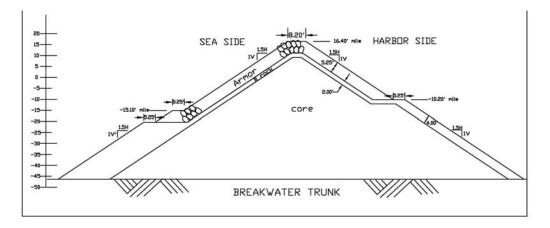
The Breakwater Trunk Cross Section is common to Alternatives 1 and 4.
